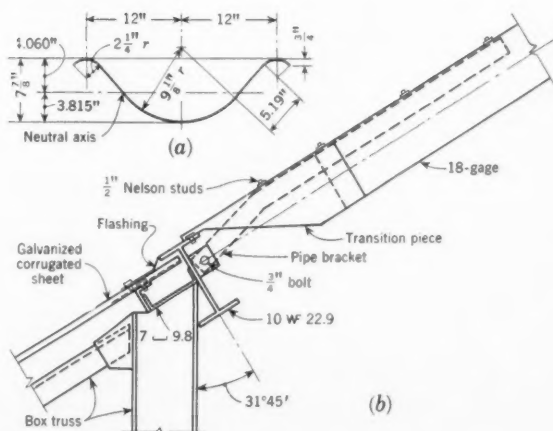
Sections for roof, detailed in (a), were developed from 18-gage galvanized sheets and were connected to columns and trusses as shown in (b).
